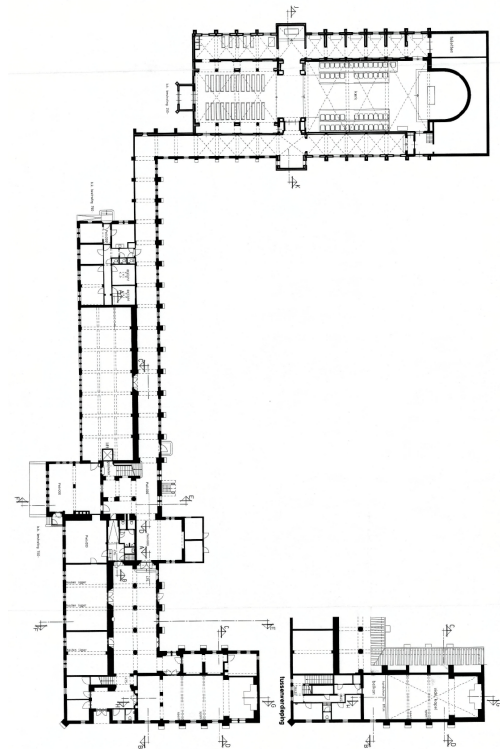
Floor plan Abbey of Egmond (1955): Ground floor.
